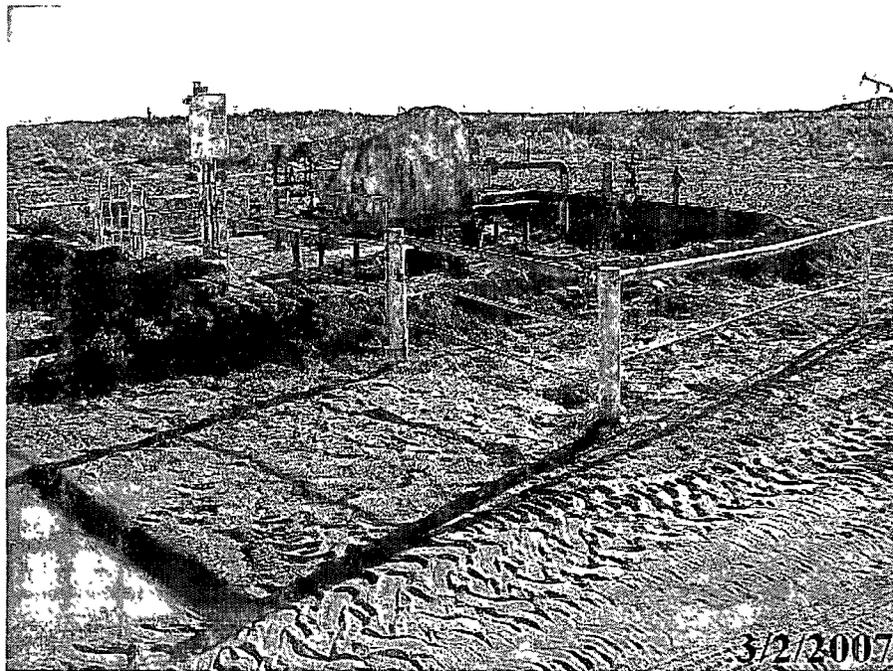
Looking southeasterly across excavation at installation of impermeable barrier.
